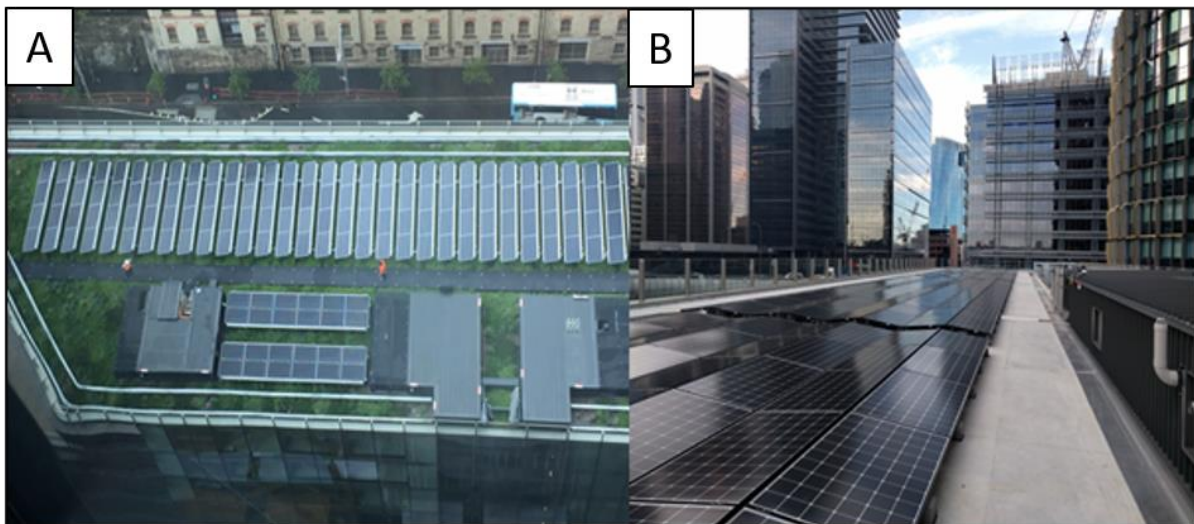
A) Daramu House green roof, view from Barangaroo Tower 1 and B) International House rooftop looking southward.
